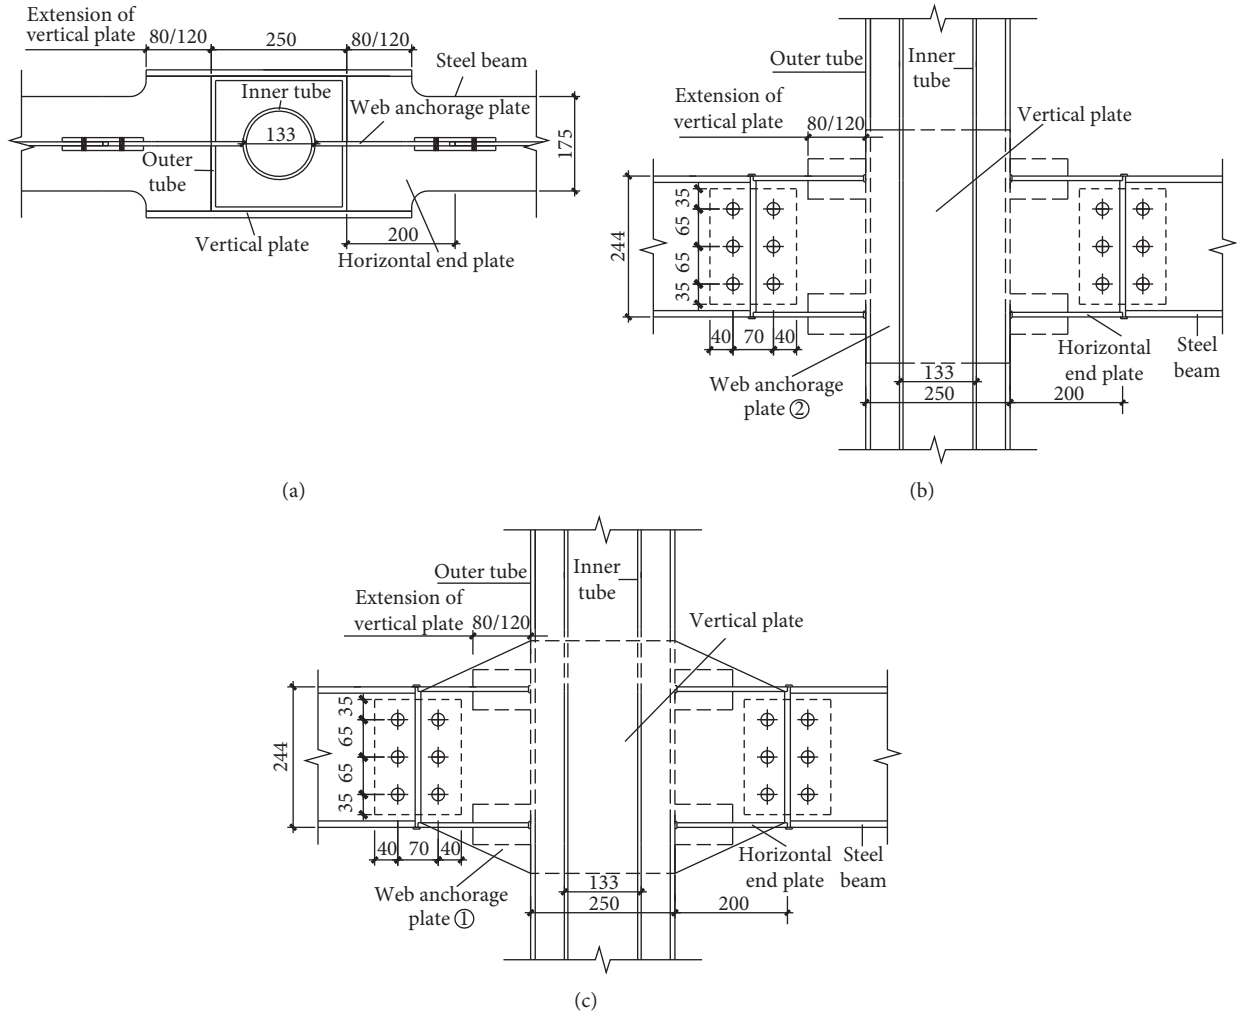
Details of the joint specimens. (a) Plan view of a specimen. (b) Elevation view of the SBJ1-1 and SBJ1-2 specimens. (c) Elevation view of the SBJ2-1 and SBJ2-2 specimens.
